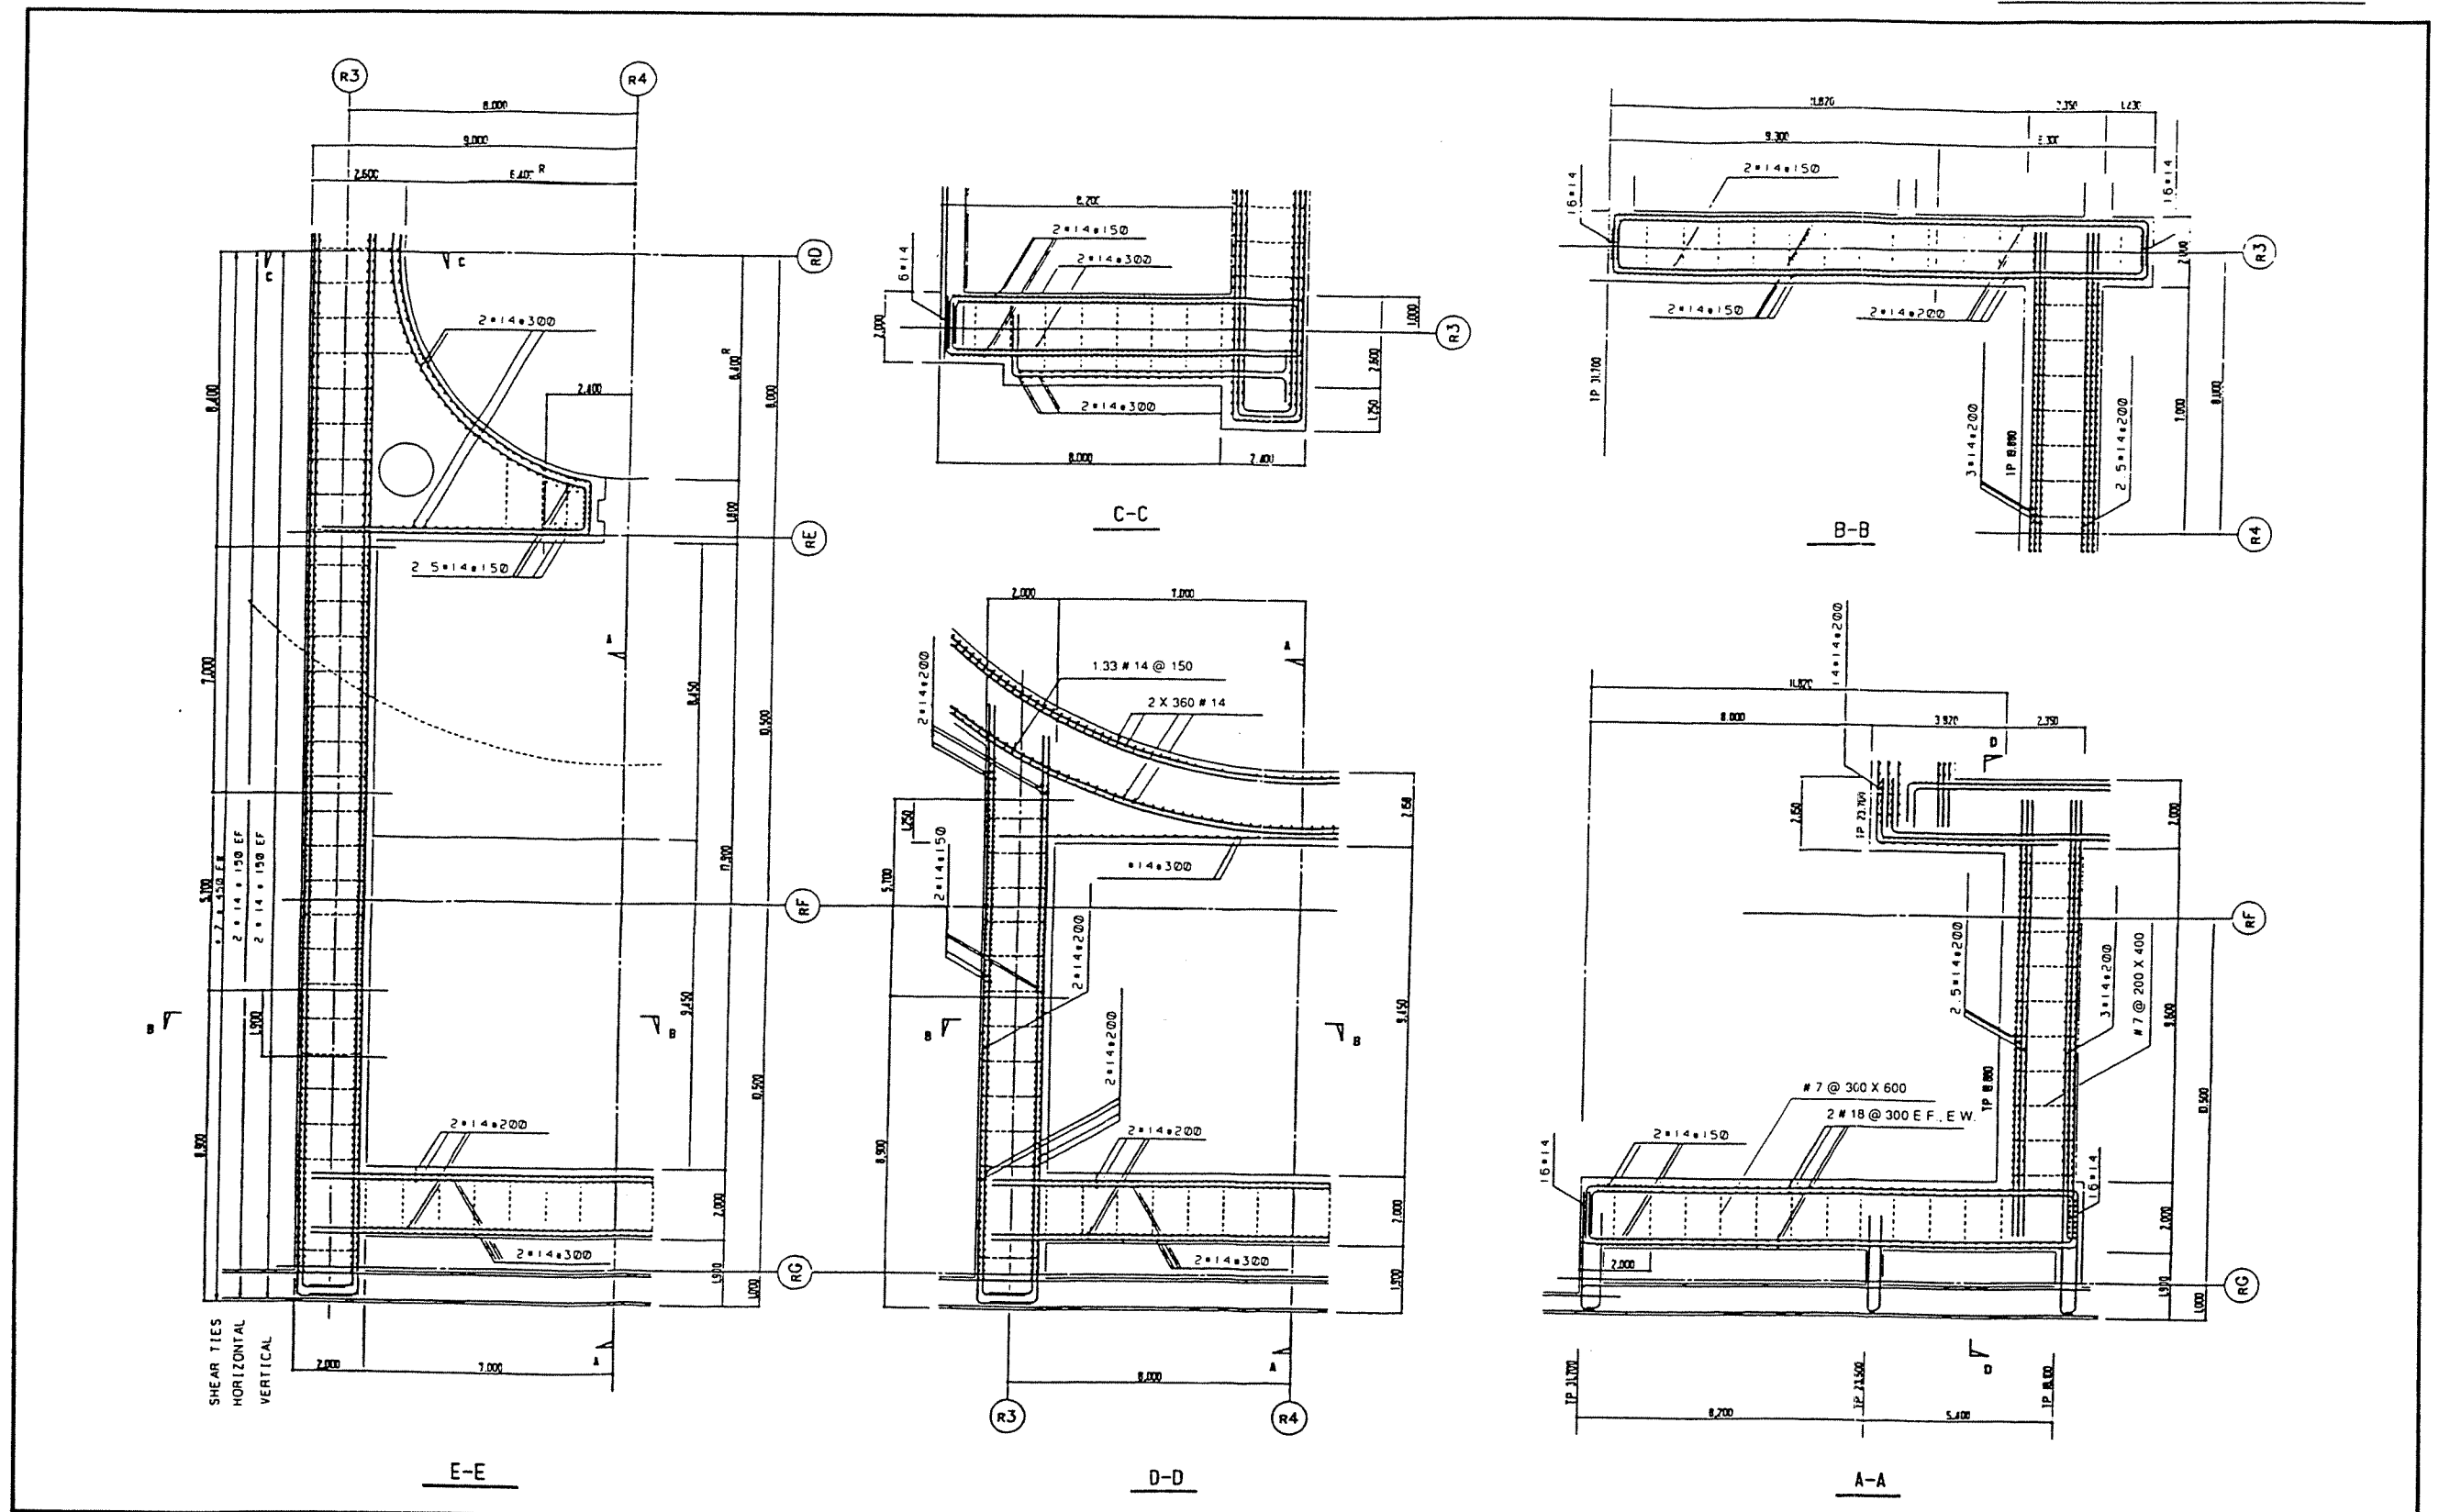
H.1-29 REBAR ARRANGEMENT OF F/P GIRDER AND SLAB (1/2)
